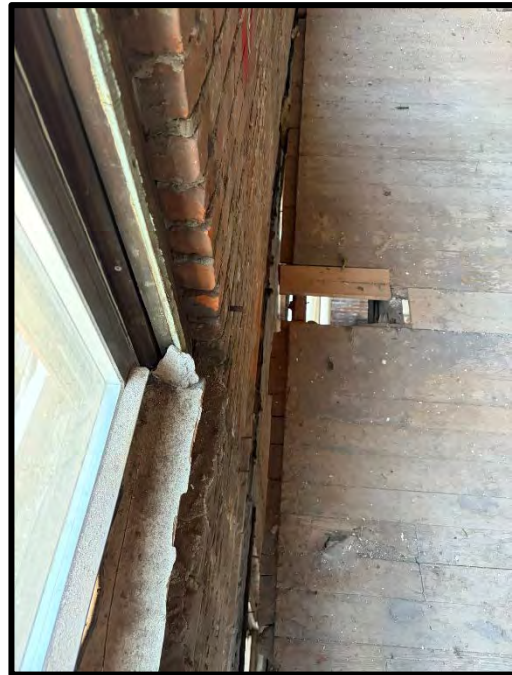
(right) Interior west façade at third floor showing gap between façade and third floor framing
